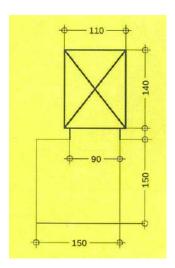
Dimensions of an elevator and its entry area suitable for wheelchair access.
